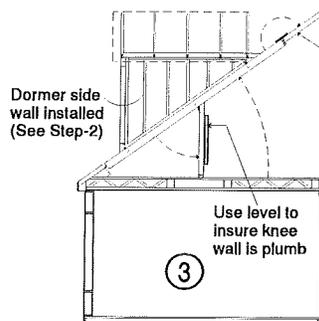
Roof Dormer Installation - Raise Dormer Top Chords
